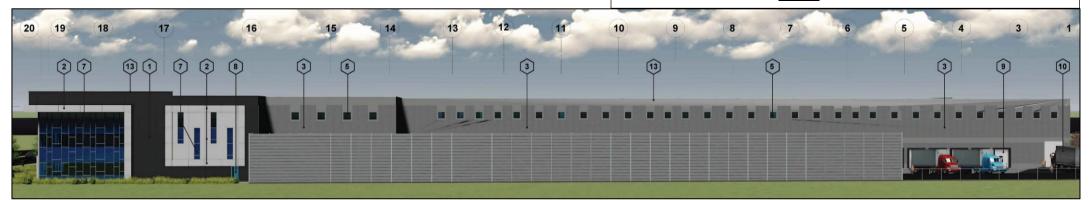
Proposed North 1.2 Elevation (Battaglia Architect Inc., March 2021)
